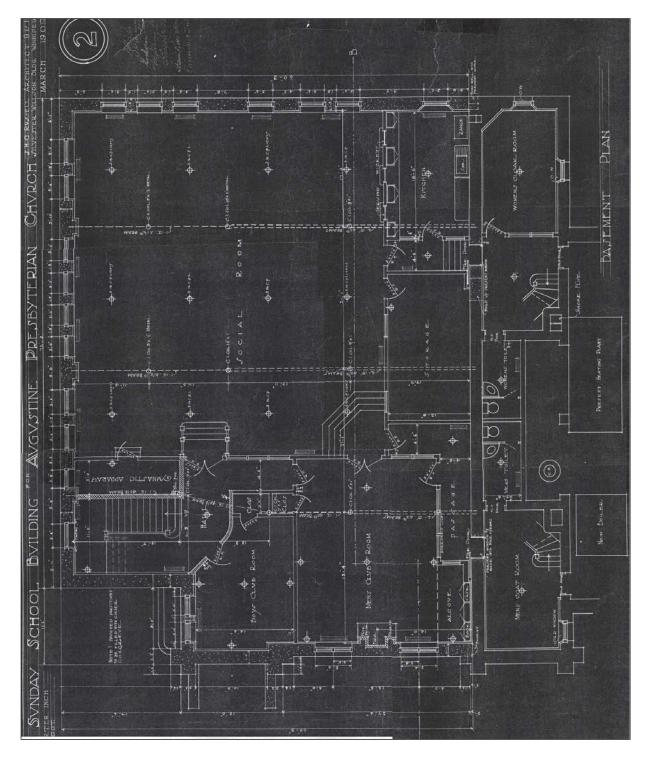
Augustine Presbyterian Church, 444 River Avenue, Architect's Plans for the Sunday School Building, "Basement Plan," 1909. (Courtesy of City Archives.)
